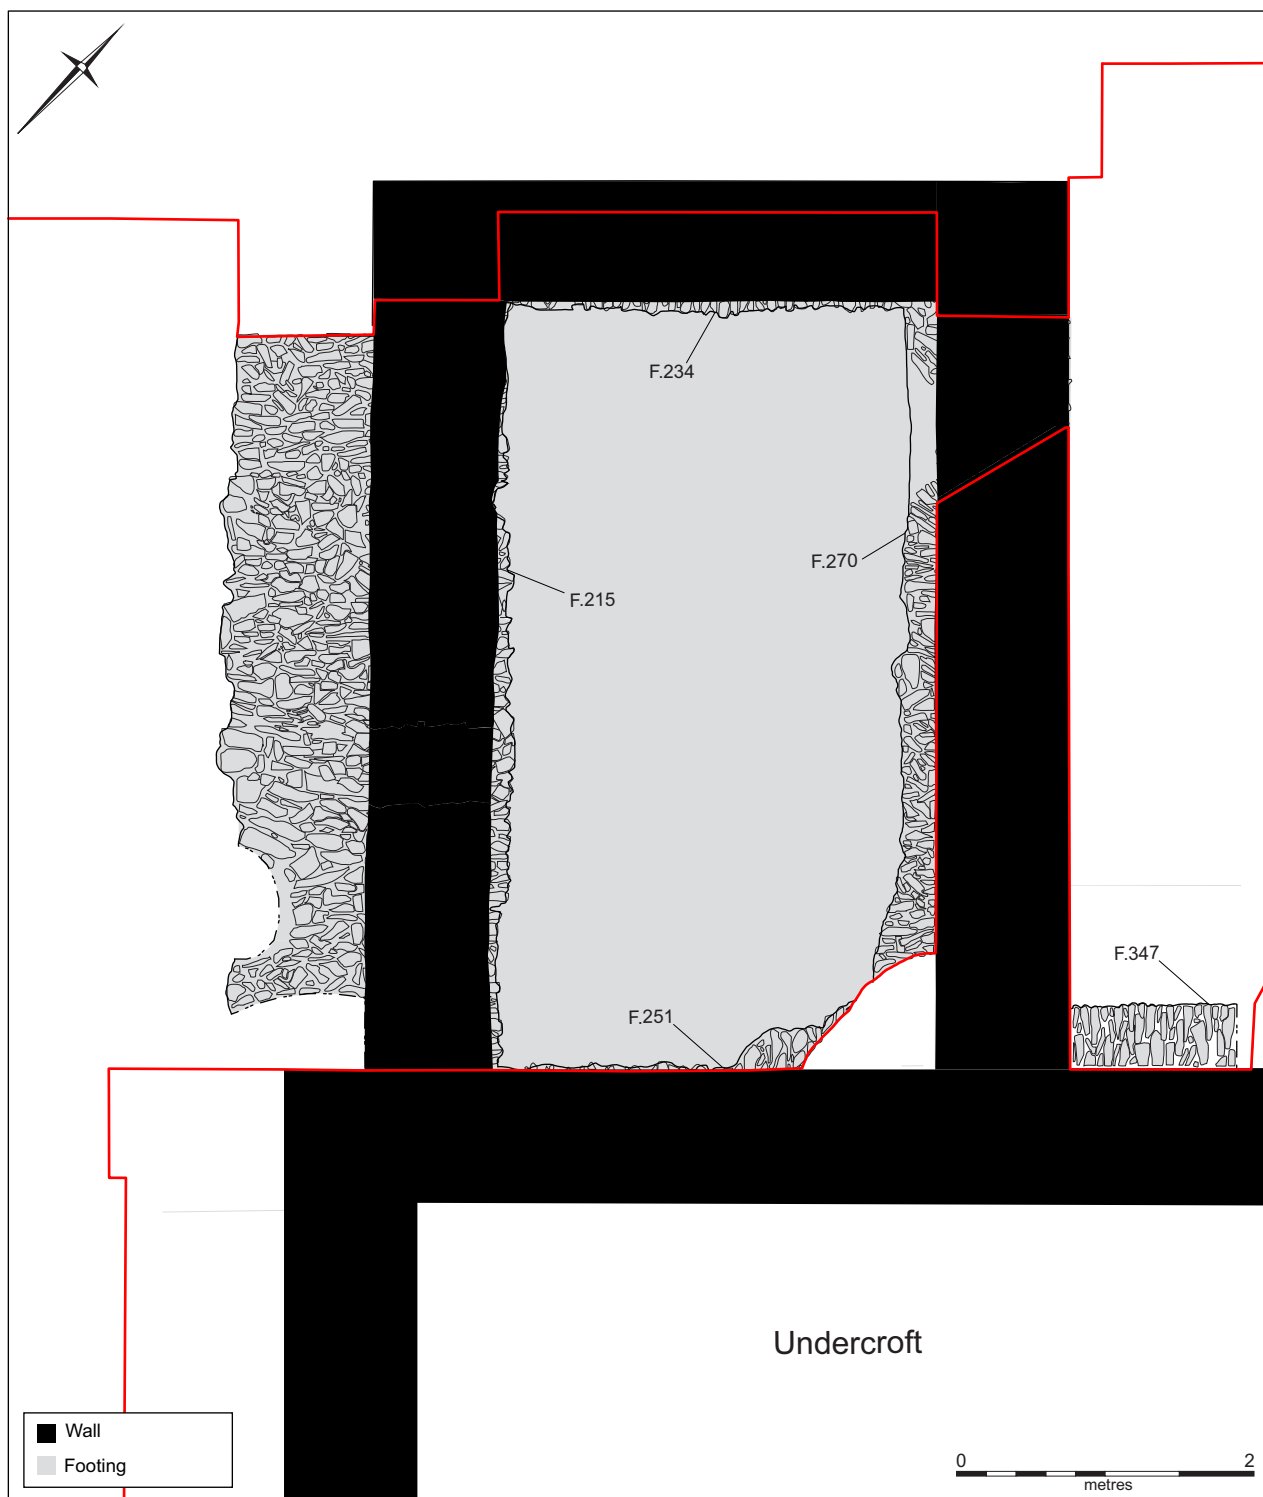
Detailed plan showing the walls of the north wing in relation to their footings.
